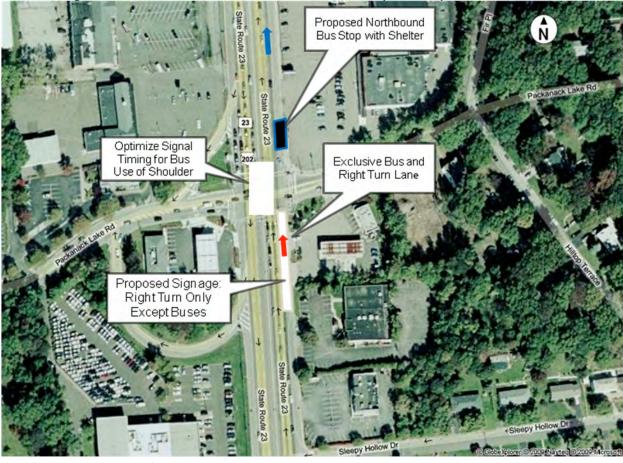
N.J. 23 and Packanack Lake Road – Proposed Improvements
